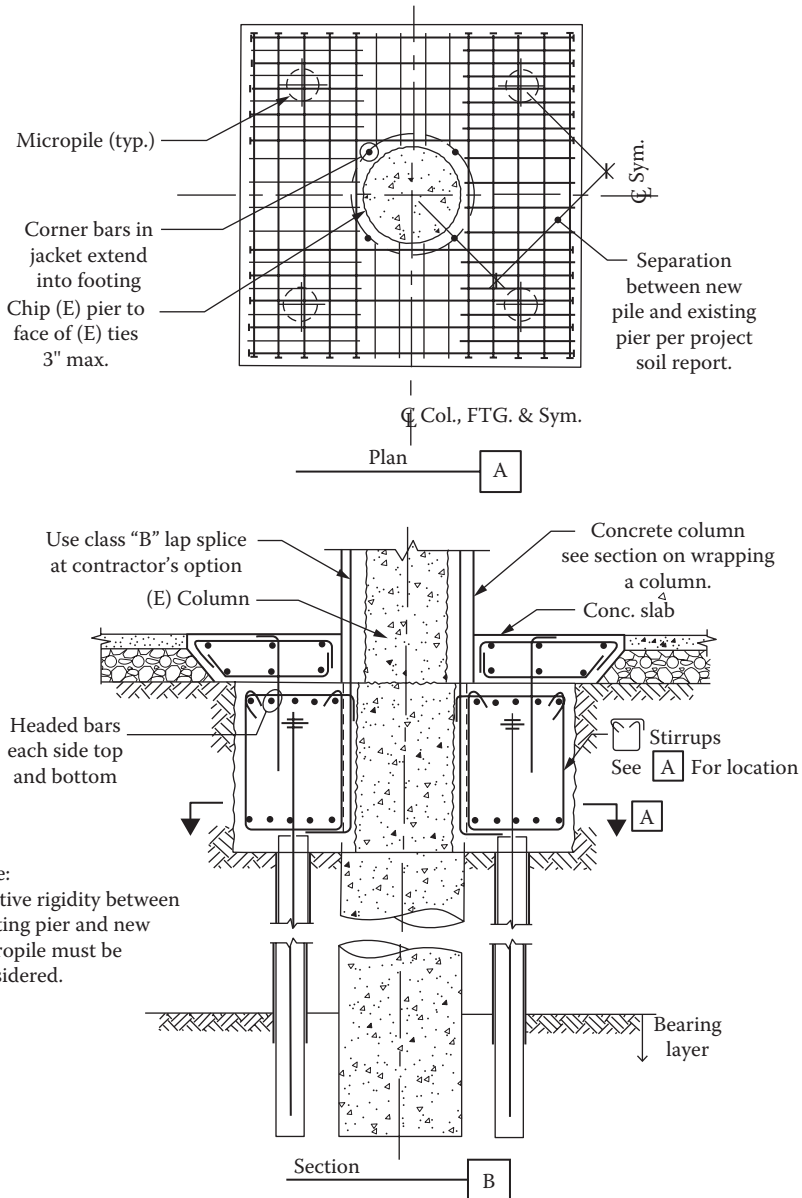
Micropile enhancement of an existing drilled pier footing.
